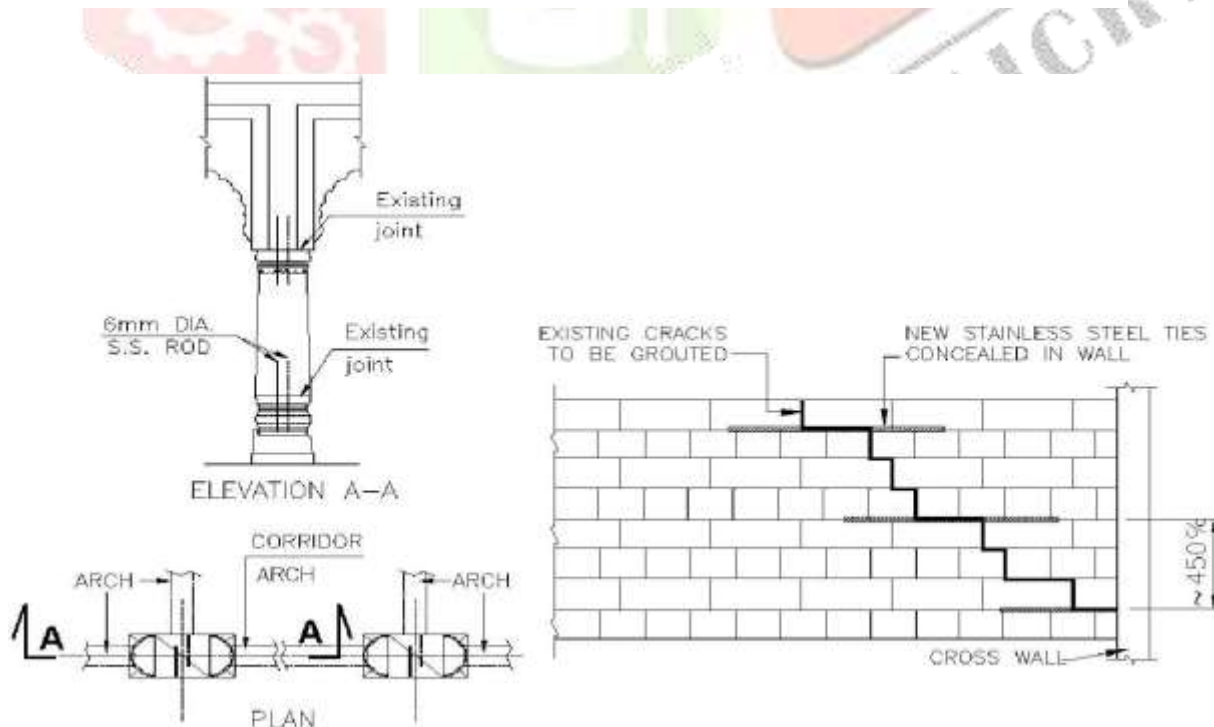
Interventions in Vertical Elements: (a) Cross Pinning of Corridor Columns, And (b) Detail of stitching cracks in walls
